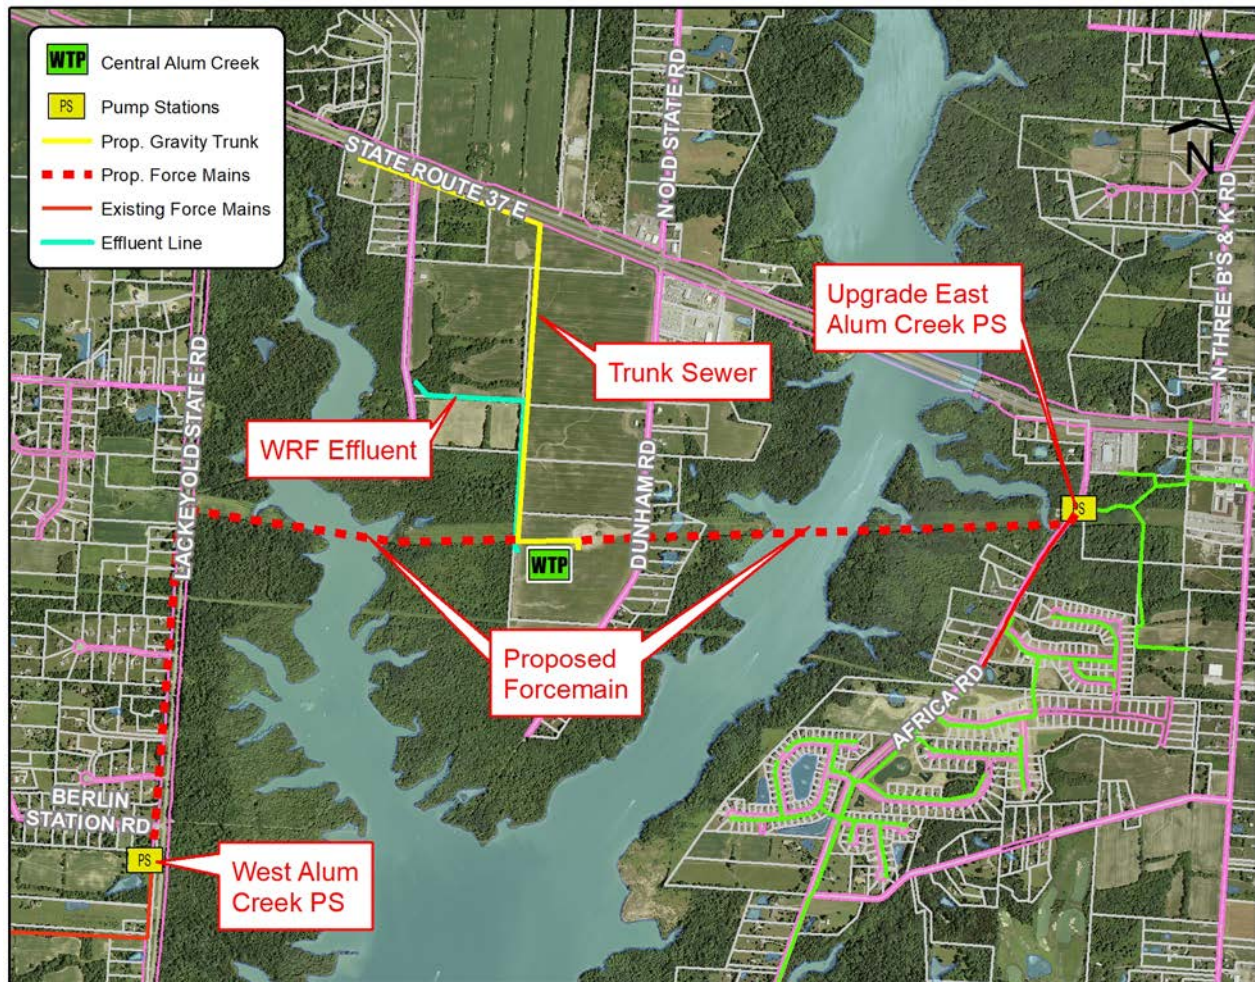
Pump Station, Forcemain, and Trunk Sewer Layout
